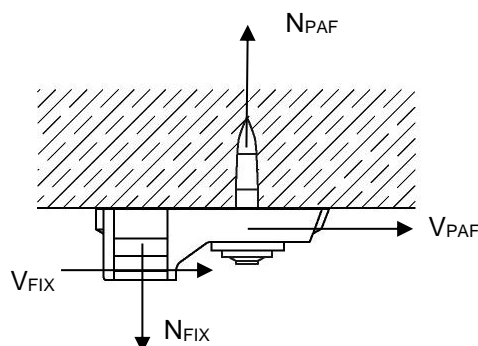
Resistances of power-actuated fastener and fixture
